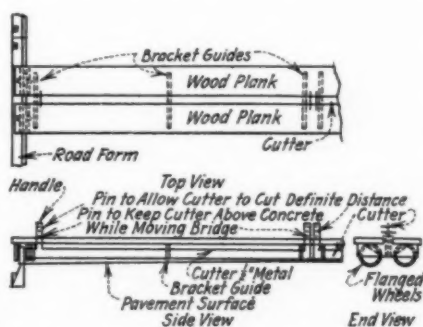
Top, Side and End View of Cutter Bridge for Contraction-Joint Construction
